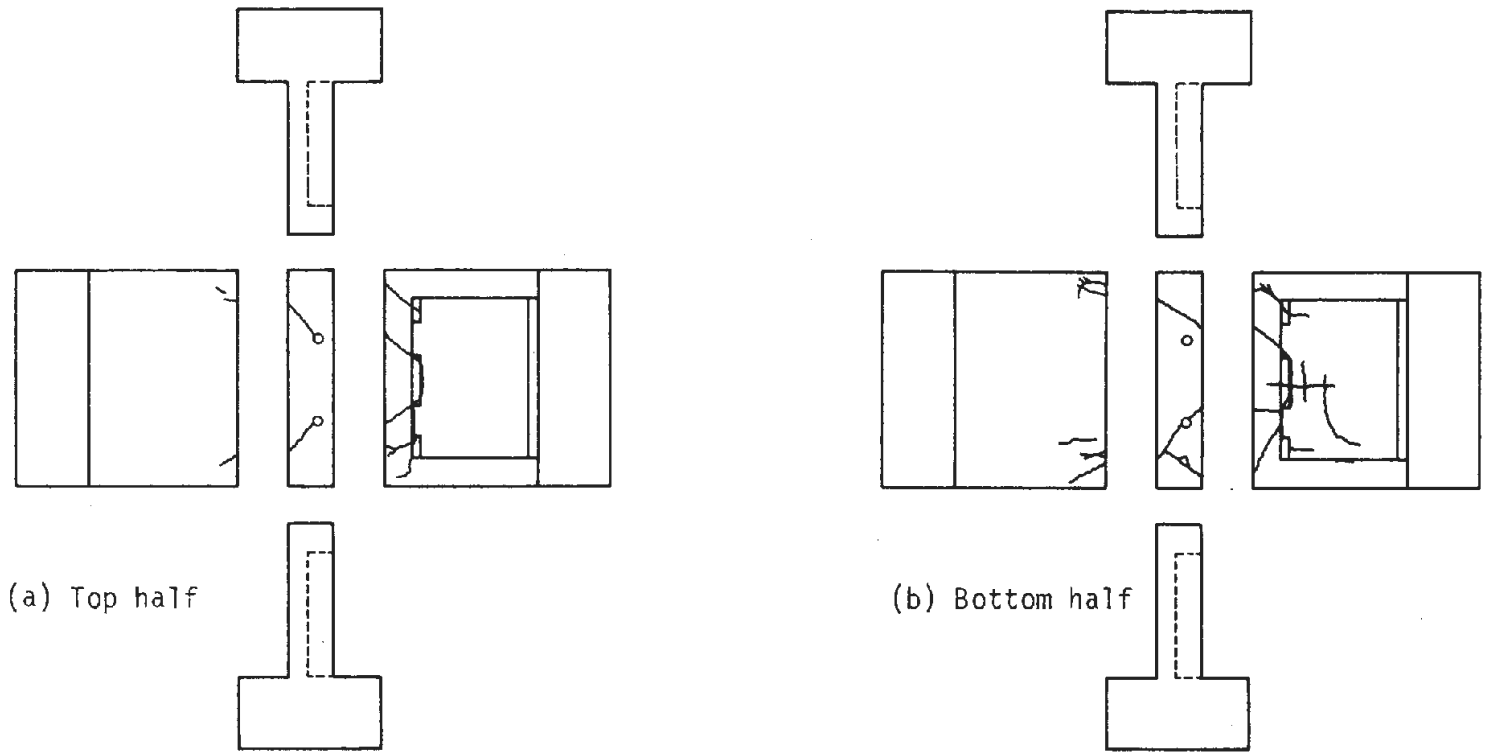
CRACKING OF SPECIMEN J-2 AFTER TEST
